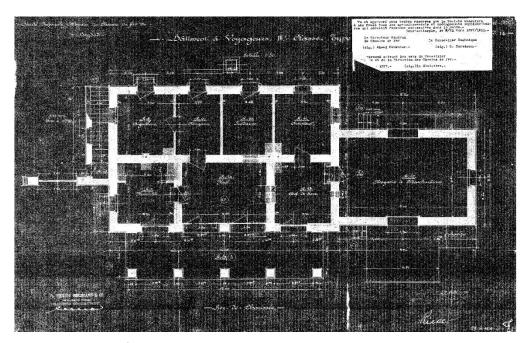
IIIrd Class / Type II project / Ground floor plan
